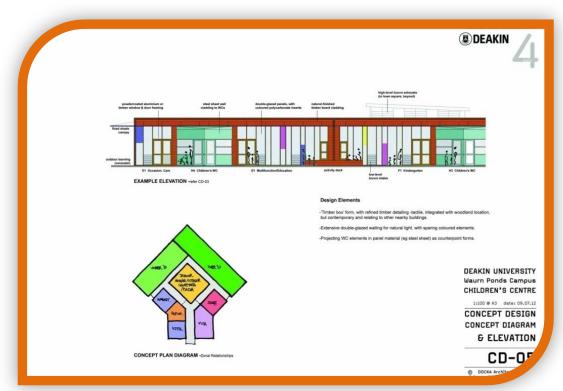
Concept design, concept diagram and elevation | Source: dock4architects (2016)
